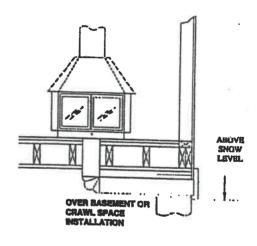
FIREPLACE CHIMNEY AND AIR INTAKE INSTALLATION
